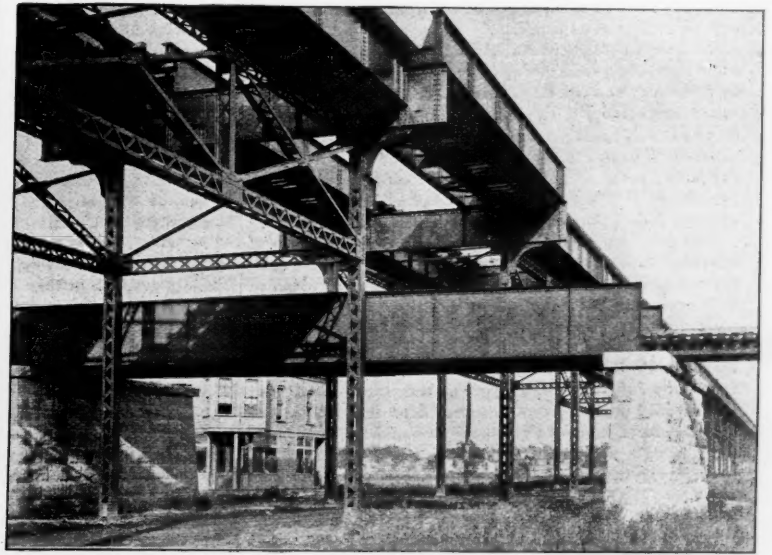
Crossing of Lake Street Elevated Railroad and Belt Railway of Chicago on West Lake Street.
